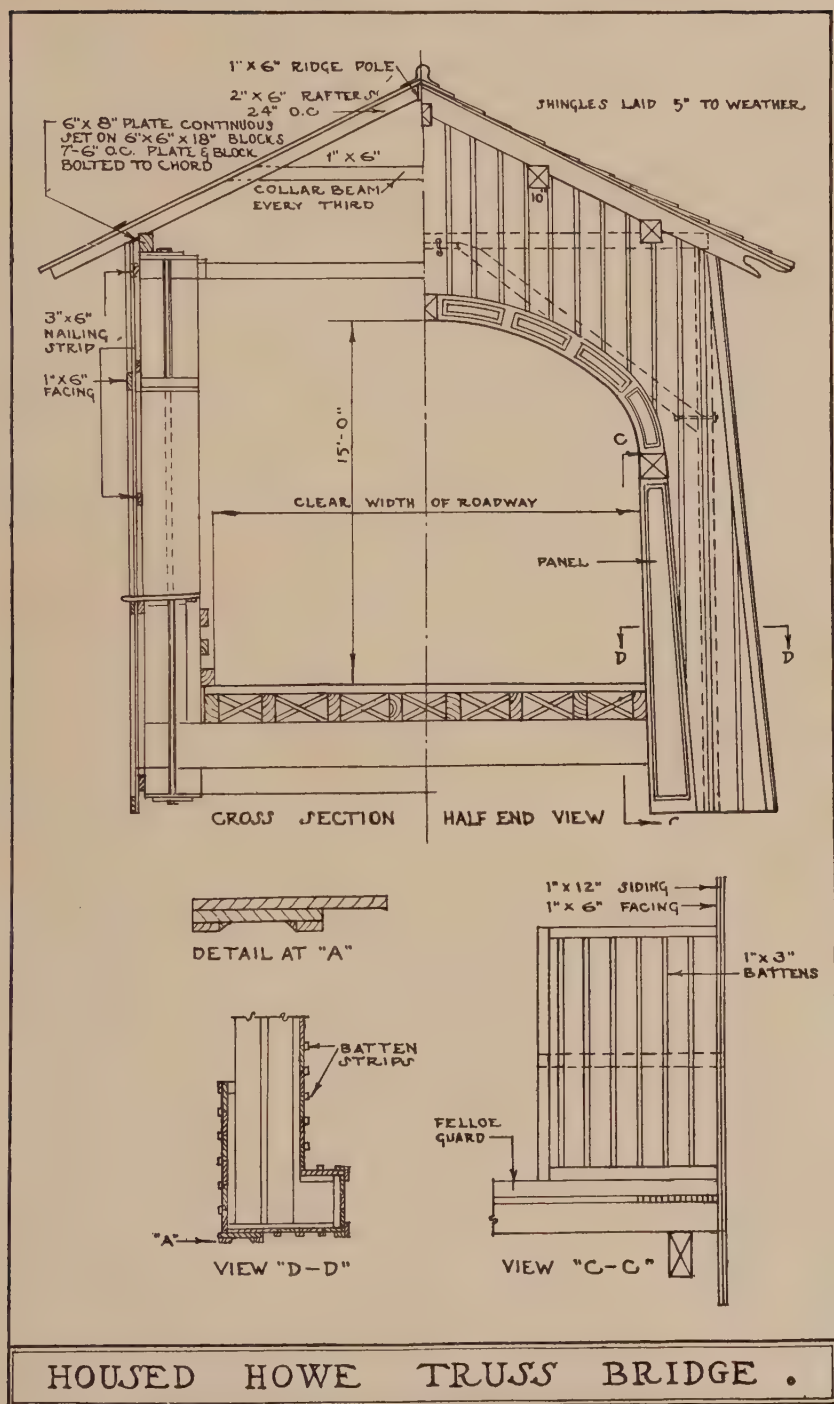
Housed highway bridge of Howe truss type. Same bridge as shown in Fig. 128.
